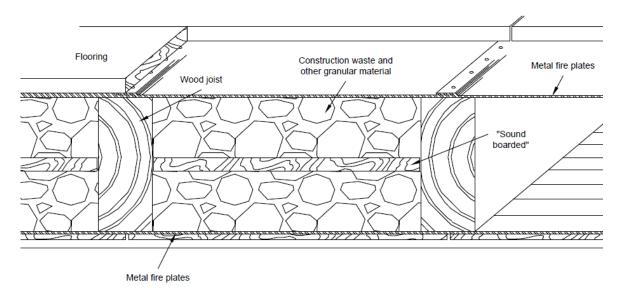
An alternative configuration of installing metal plates on wooden joists (as adapted from [9])
